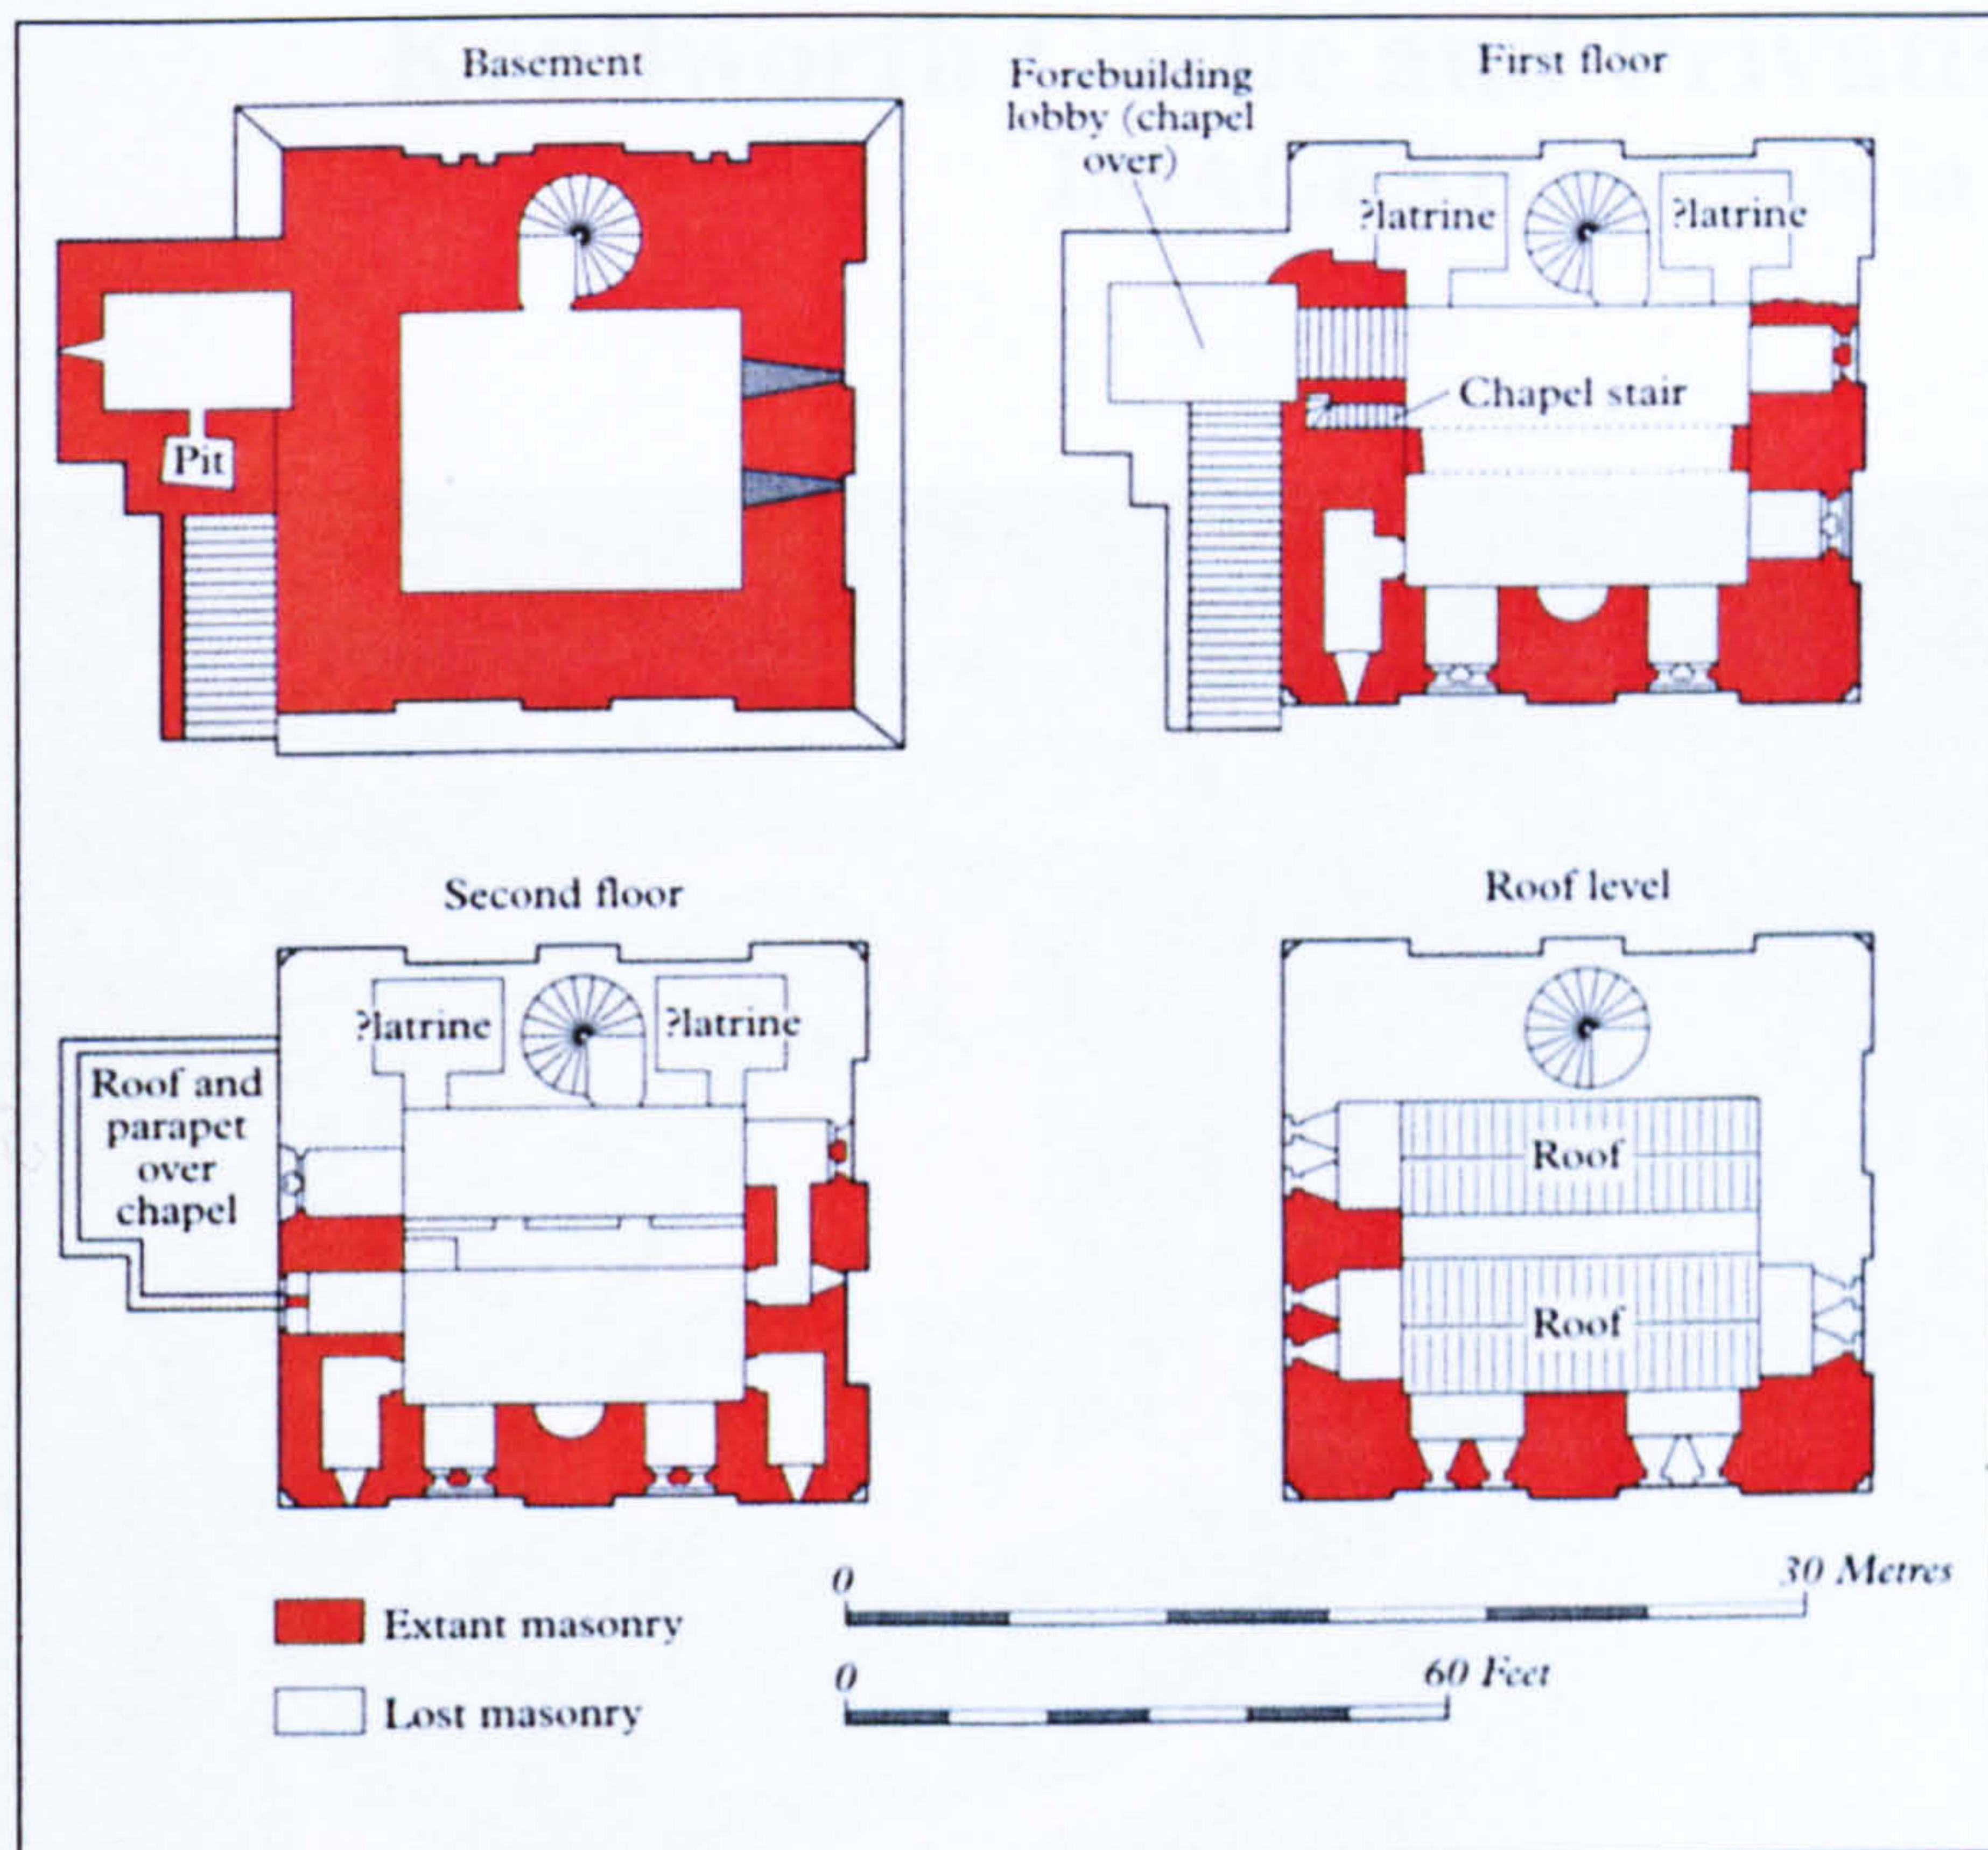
Floor plan of Scarborough Castle Keep (Goodall 2000, 16).
